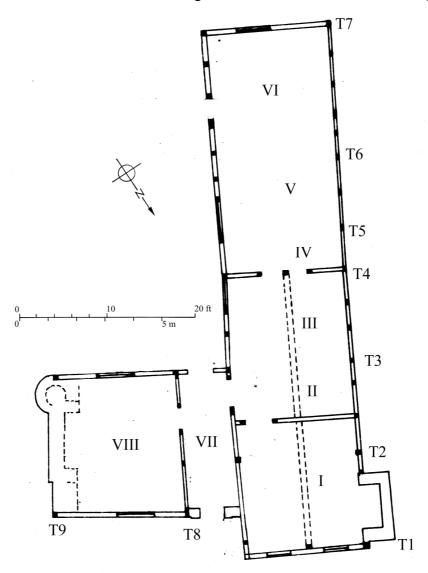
Plan, showing truss and bay numbering (after OBR).
